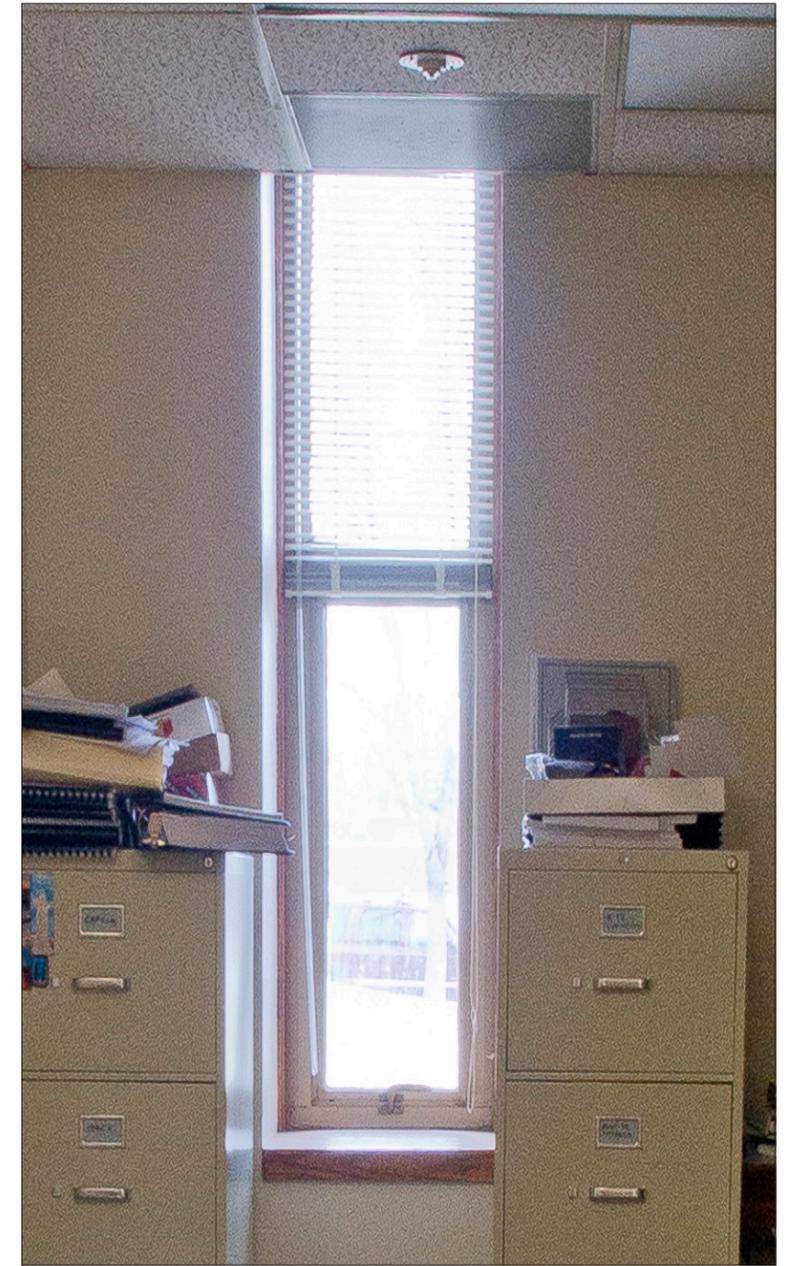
Garden Level Narrow Aluminum Replacement Window Unit with Operating Awning Sash [Window S-035]. Historic surrounds are not present at Phase 3. Note drywall jambs, dropped ceiling, and replacement wood stool.
